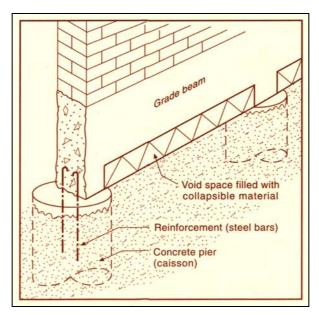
Drilled pier foundation. From Noe and others (1997); modified from Holtz and Hart (1978).
